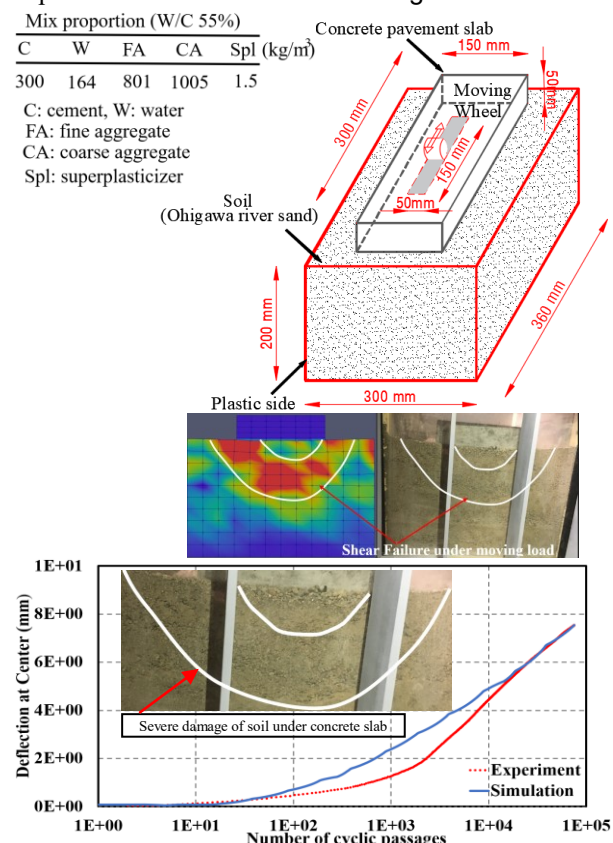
Analysis for the small-scale concrete pavement modelling of experiment and simulation
